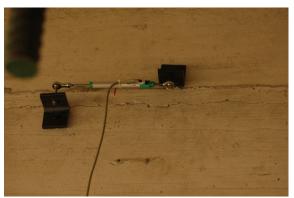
Position 1S: Slip crack at the top of the southern wall in the ground floor
